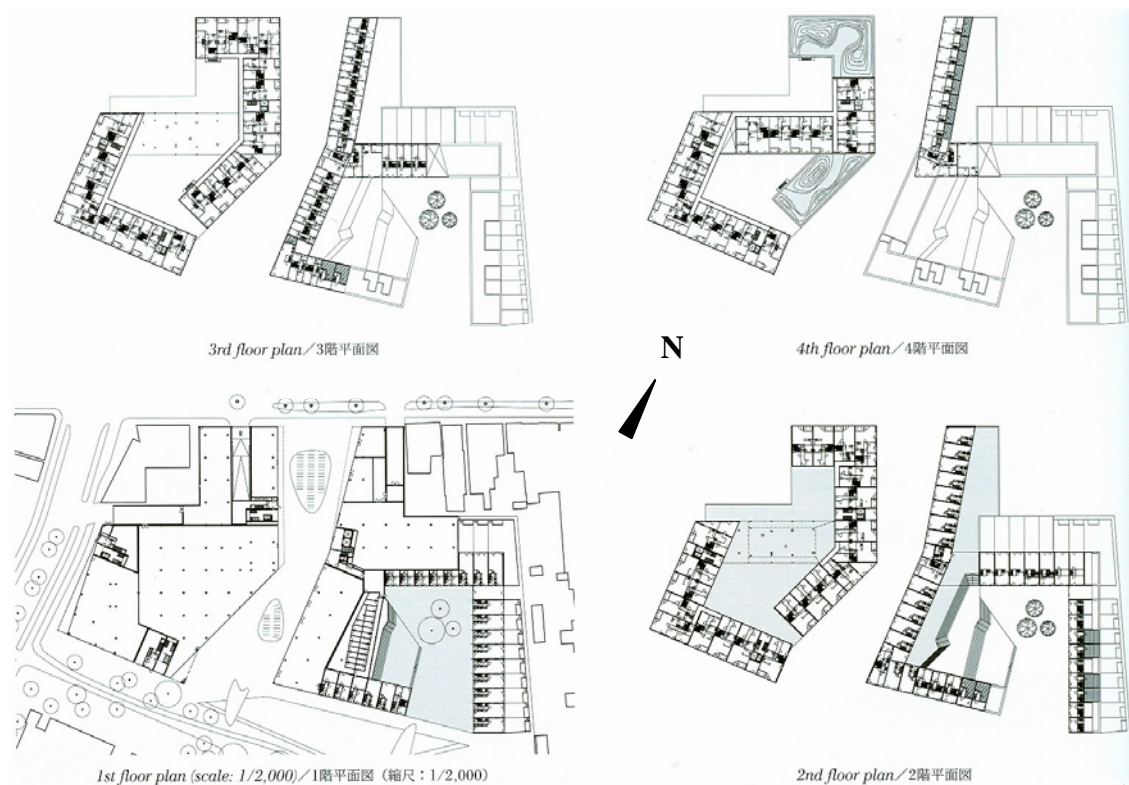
3.6.7: Schots 1 and 2 overall layouts – floor plans
